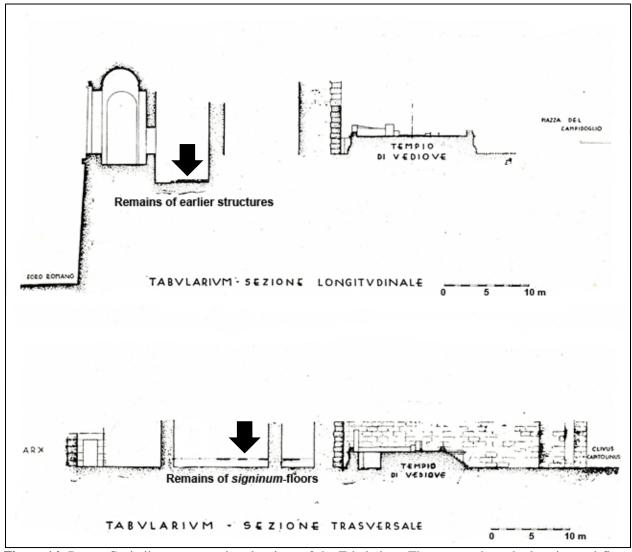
Rome, Capitoline: cross-section drawings of the Tabularium. The arrows show the location and floor level of the concrete houses (after Colini 1942).
